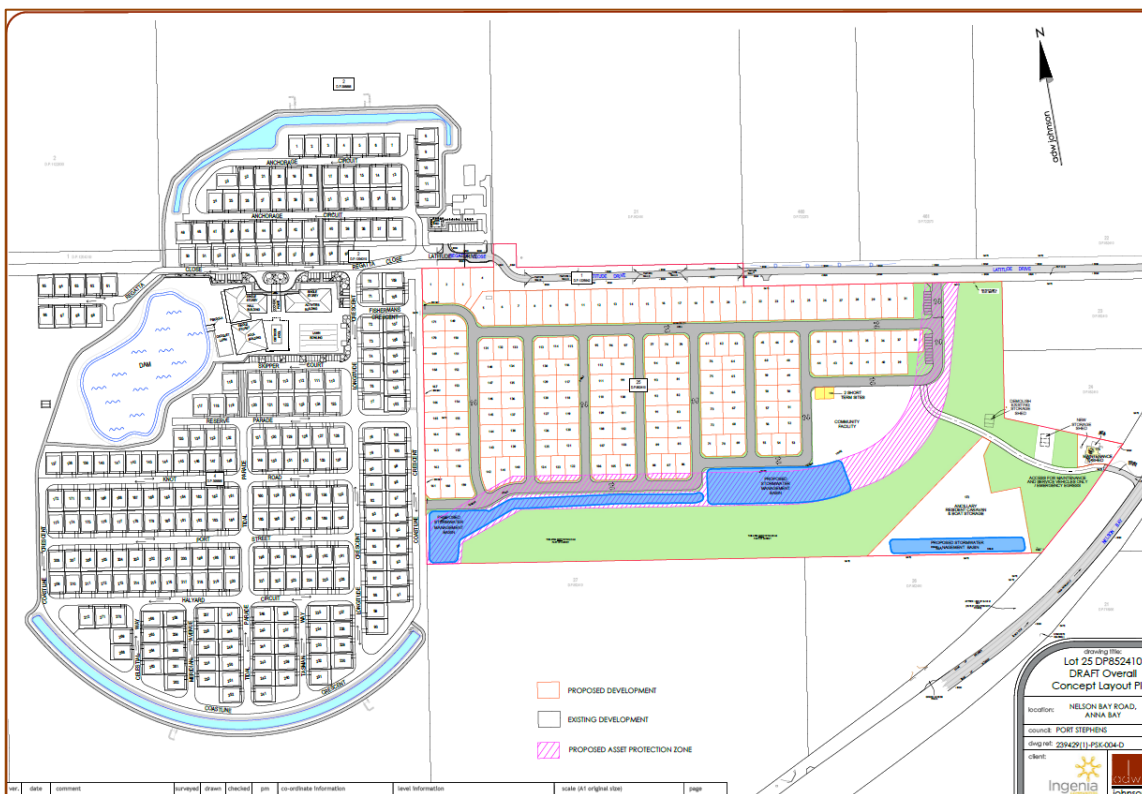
Draft Concept Layout Plan for lot 25 DP852410 in relation to the approved caravan park development (Lots 2 & 4, Lot 1 and Lot 2).
